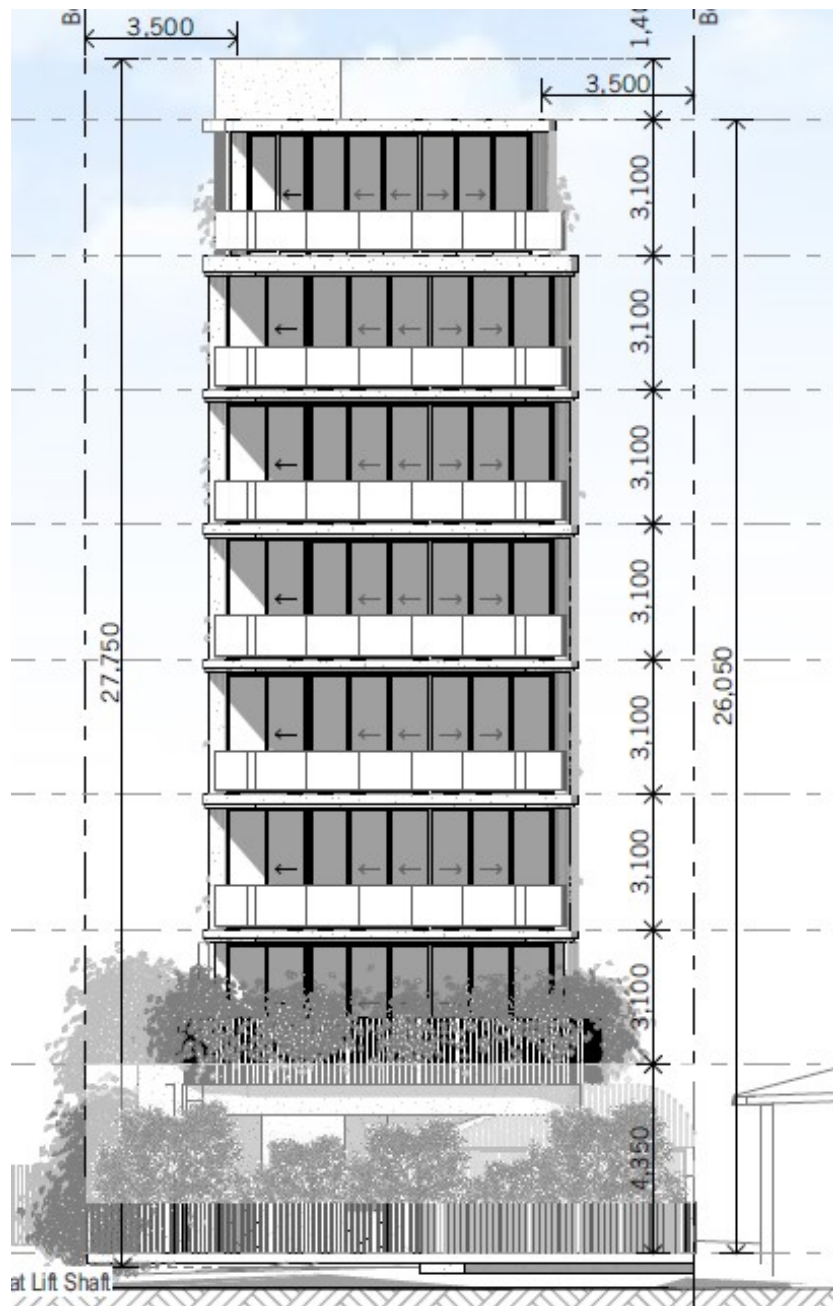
Rear (eastern) elevation (Source: Lightwave Architecture)
